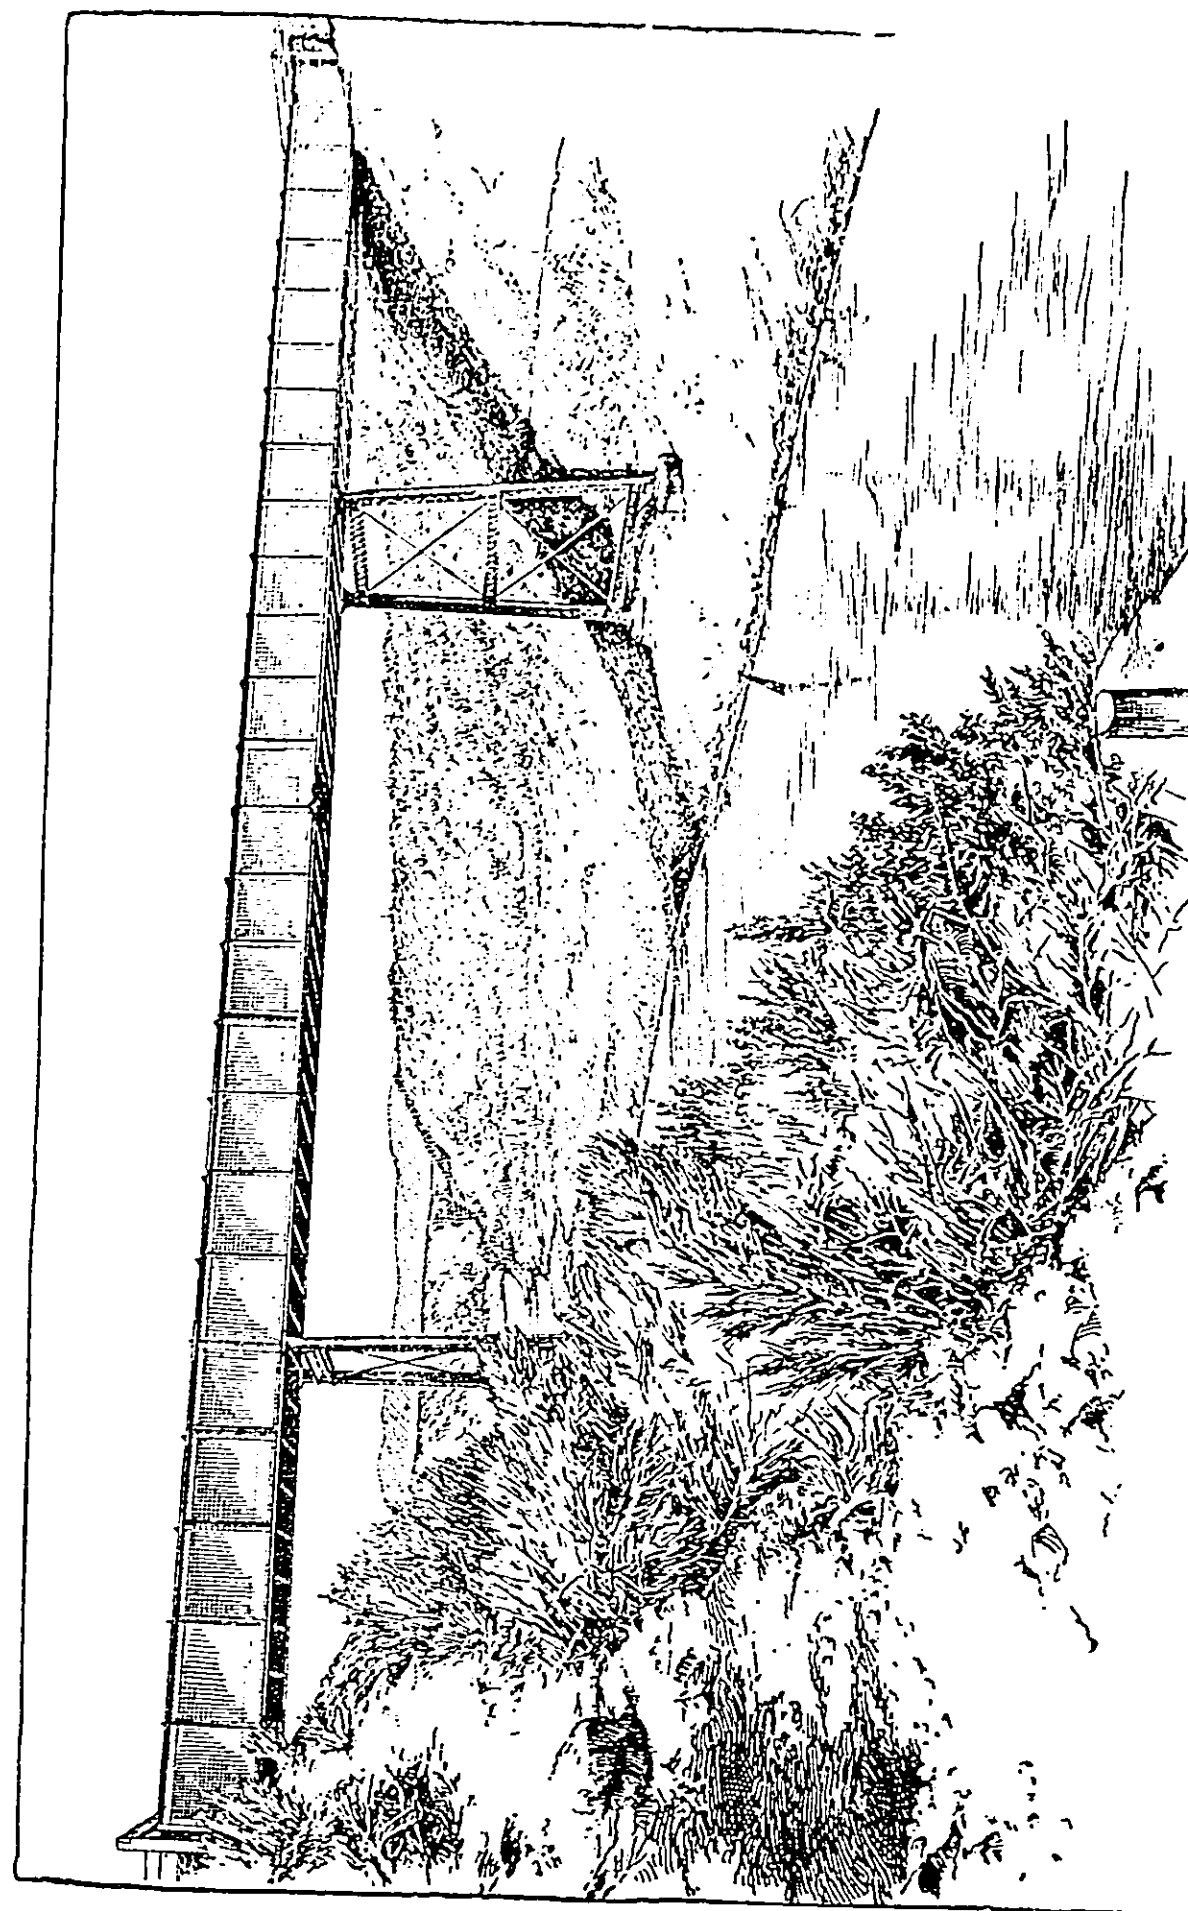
130-ft. Plate-girder Flume over Malad River.
